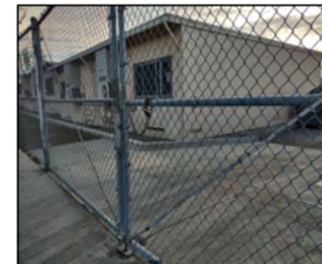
Astoria St. at Service Road Entrance; DSA Buildings to be removed
